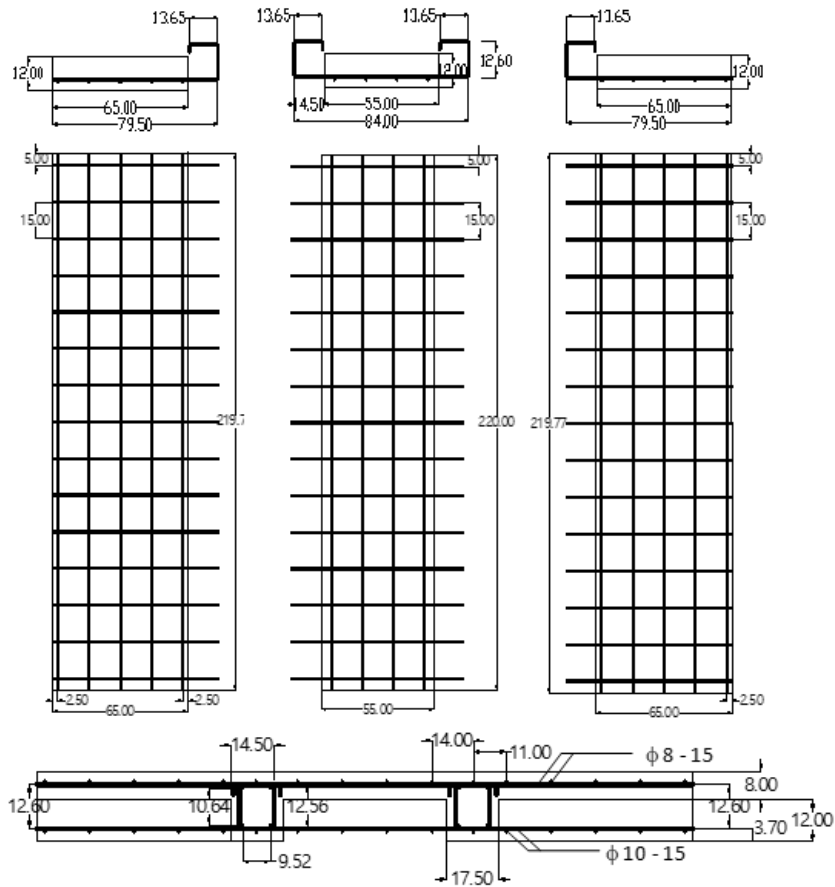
Detail of the Bar Reinforcements of the Precast Panels with Rectangular Rigid Connection (RRC)
